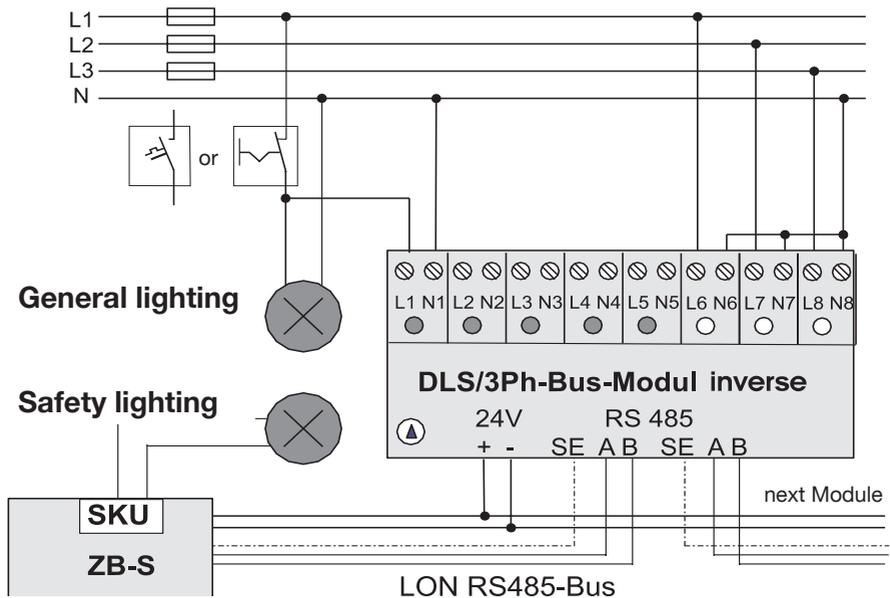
Wiring of the DLS/3PH BUS-Module inverse
